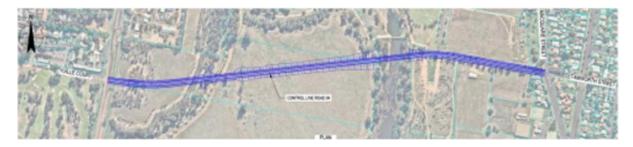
Blue alignment: Dubbo Golf Club Driveway to Tamworth Street.
